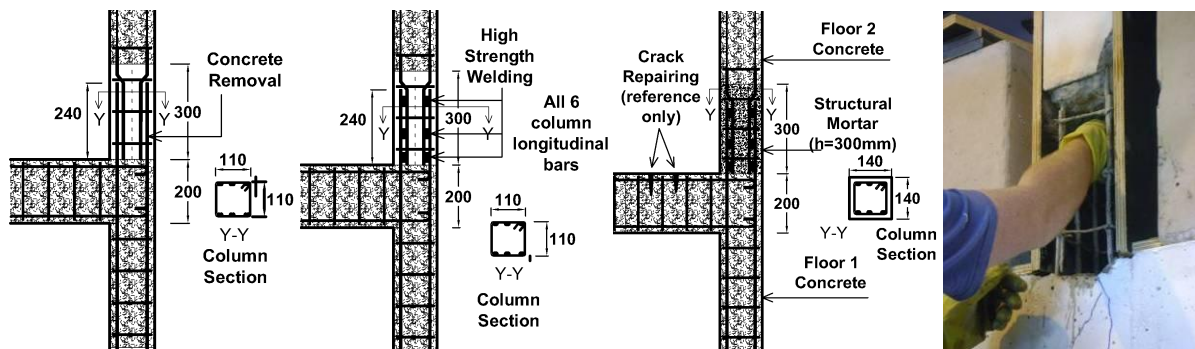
Repairing sequence: concrete removal – reinforcement welding – mortar filling
